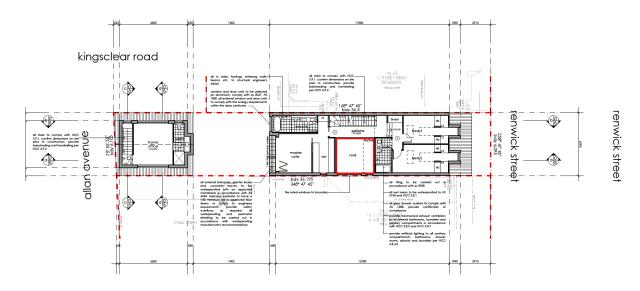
Proposed first floor plan showing large void (red outline) in the centre of the building.
